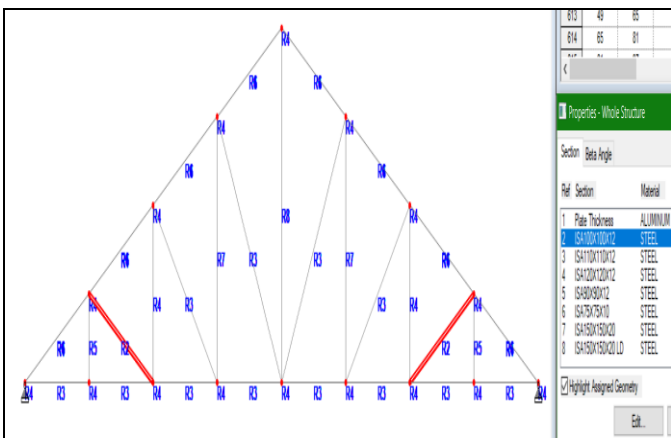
Property of Steel ISA 100 X 100 X 12 mm provided for above red colored Member of Steel Truss.
